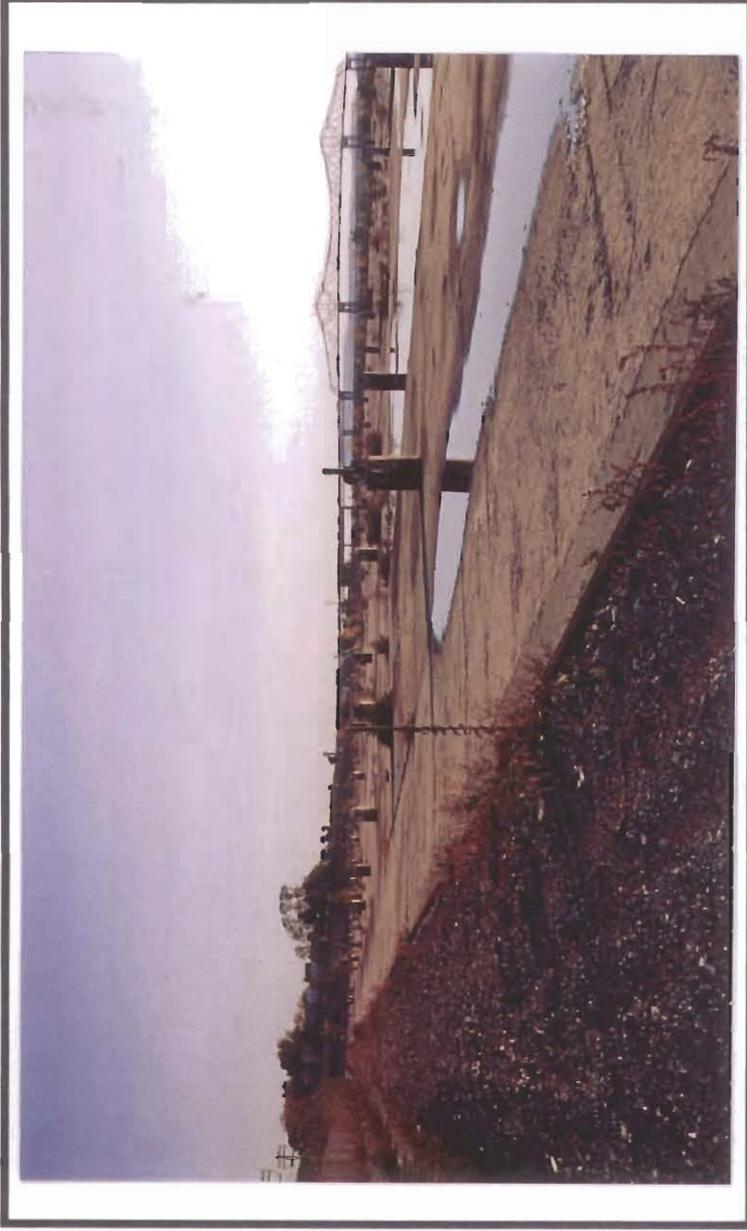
View to northwest across floor of Plant No. 2 toward Tappan Zee Bridge. In the north part of the plant the concrete based columns, different than the steel I-beam columns used in the south part of the plant, are evidence that the two parts of the plant were built at different times.
